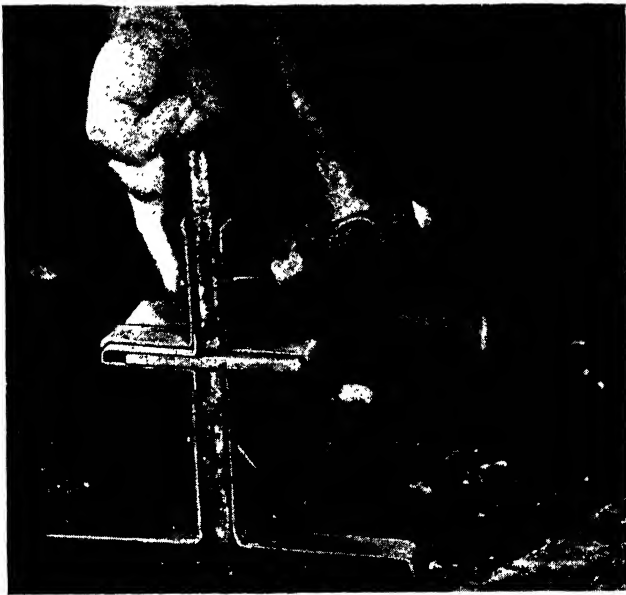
ASSEMBLING A DOWEL-PLATE JOINT.
